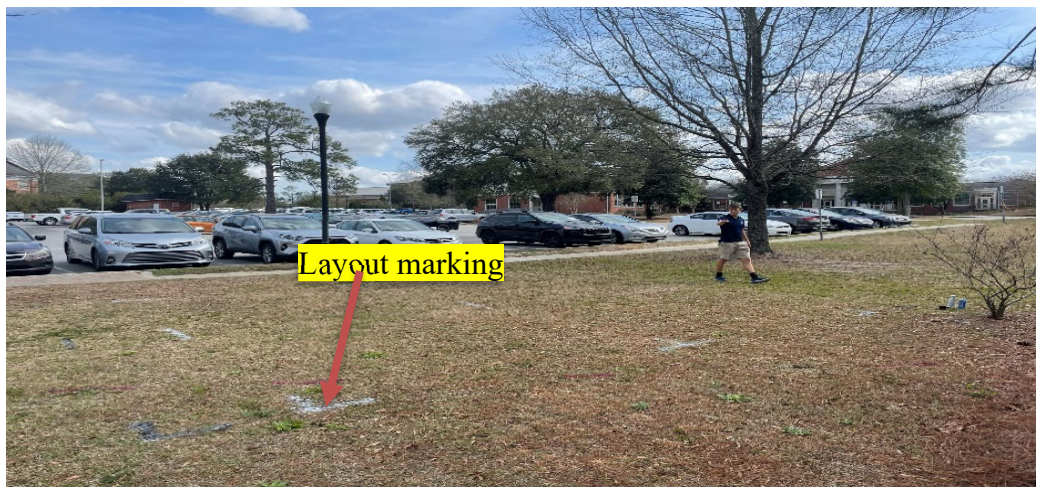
Layout marking for Field Test Site near GSU Parking Lot
